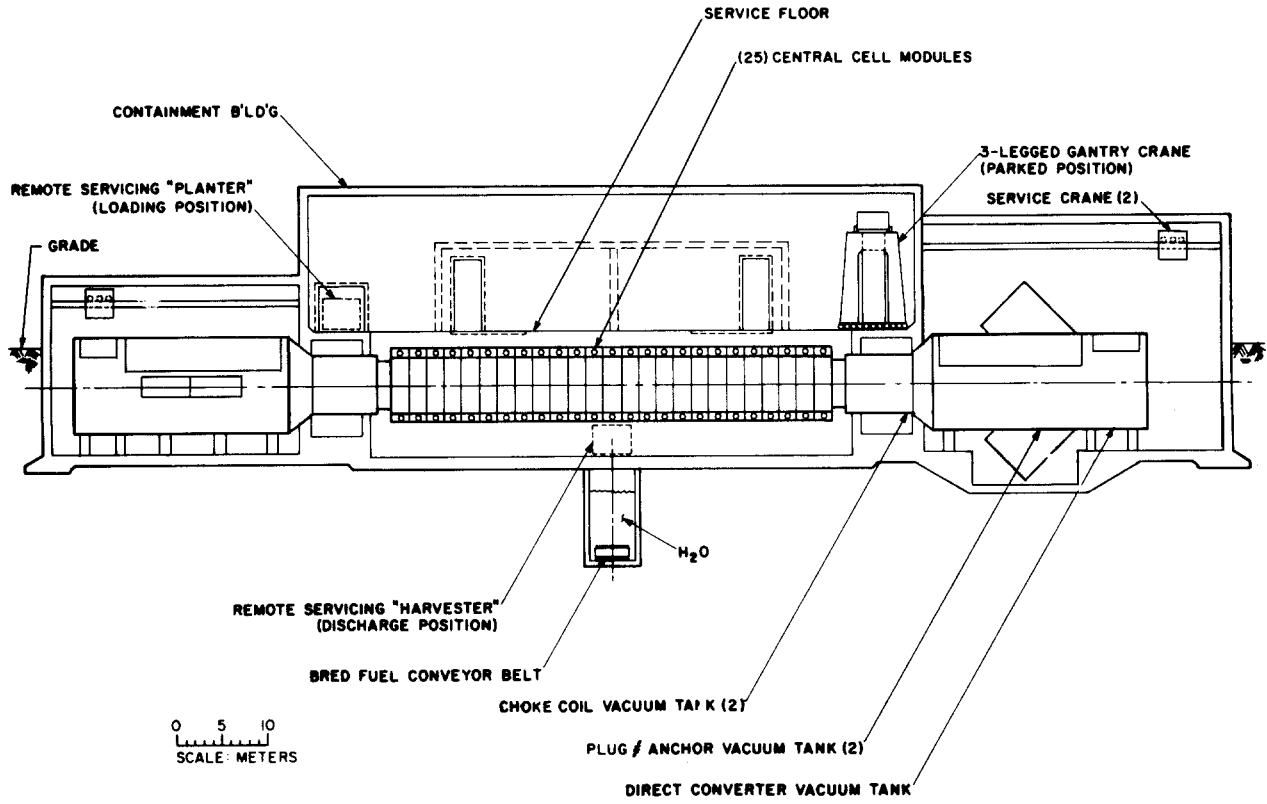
Elevation view of containment building with production tandem mirror reactor.
